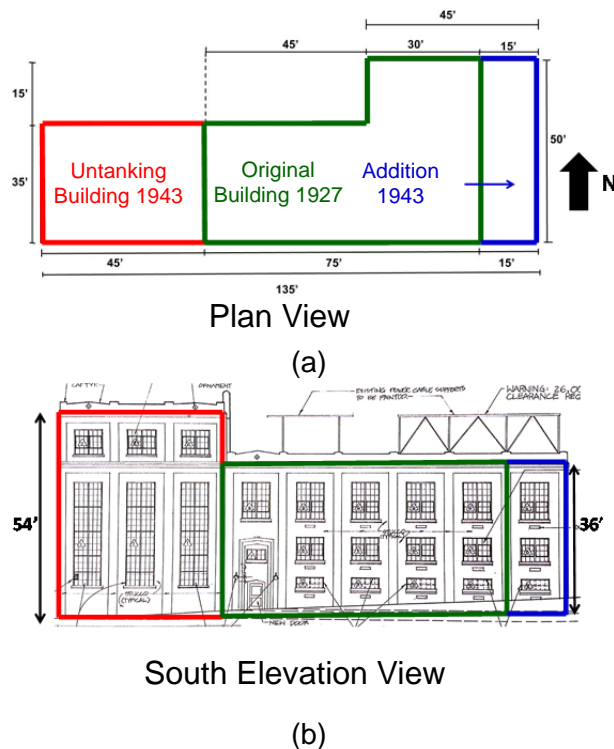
Control Building: (a) Plan and (b) South Elevation View
